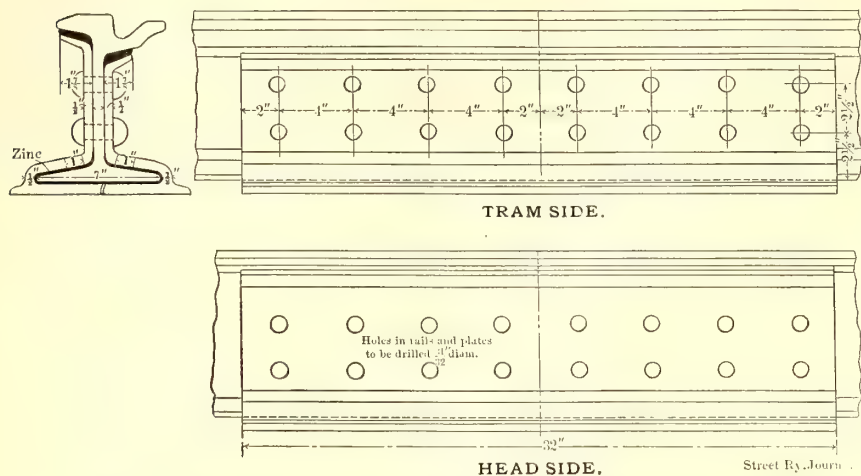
CROSS SECTION AND SIDE ELEVATIONS OF ZINC JOINT
